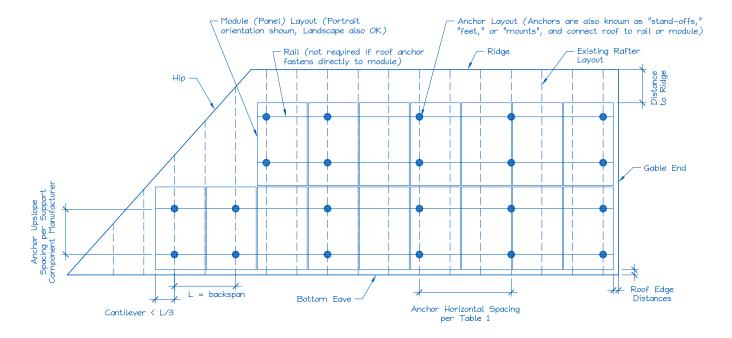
Sample Solar Panel Array and Anchor Layout Diagram (Roof Plan).
